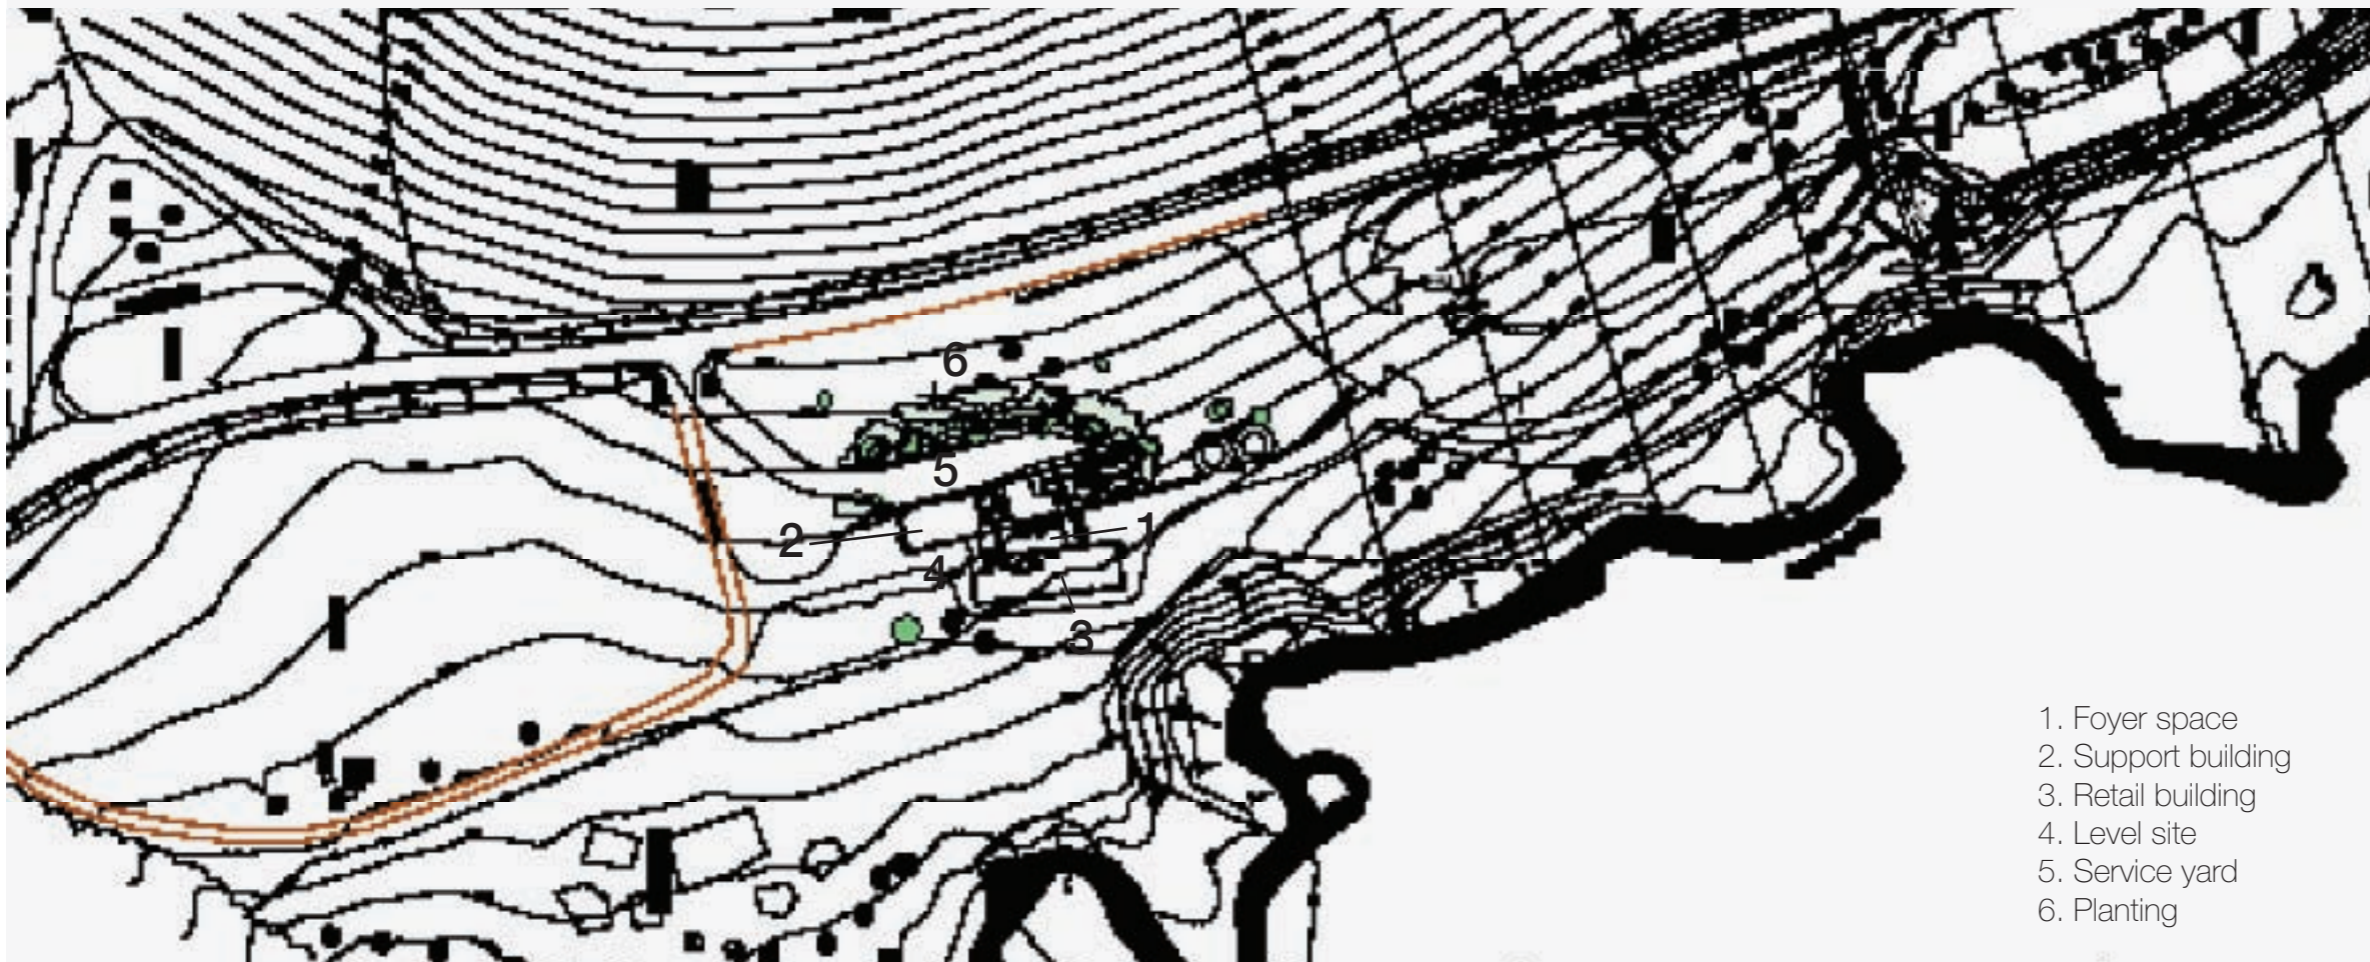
is the original concept in its simplest form at around 650sqm. All the facilities are housed within a generous specified single storey extruded timber construction and form a very modest but higher quality building.
